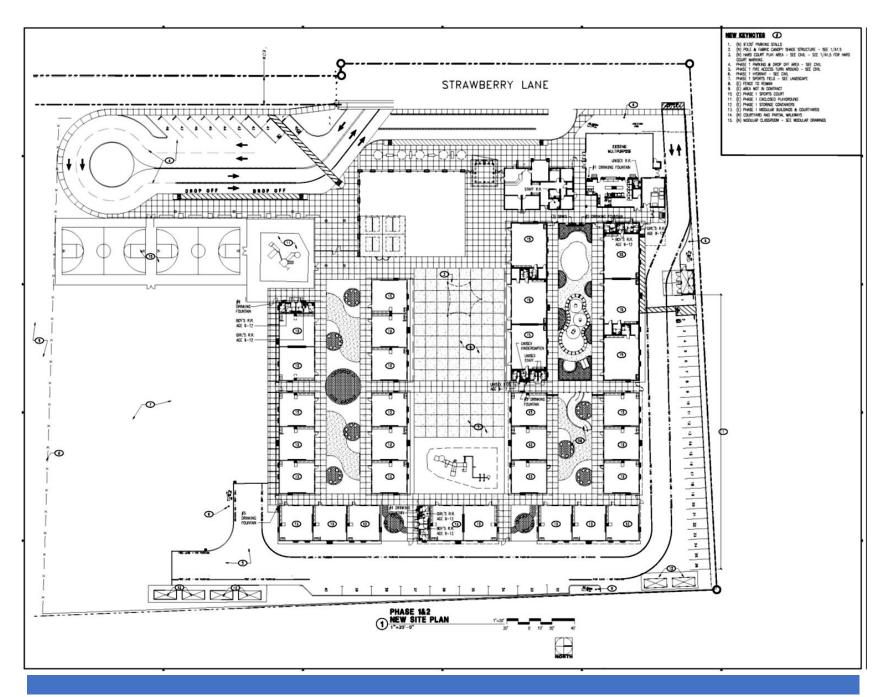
PROPOSED SITE PLAN Source: GRA Architecture
